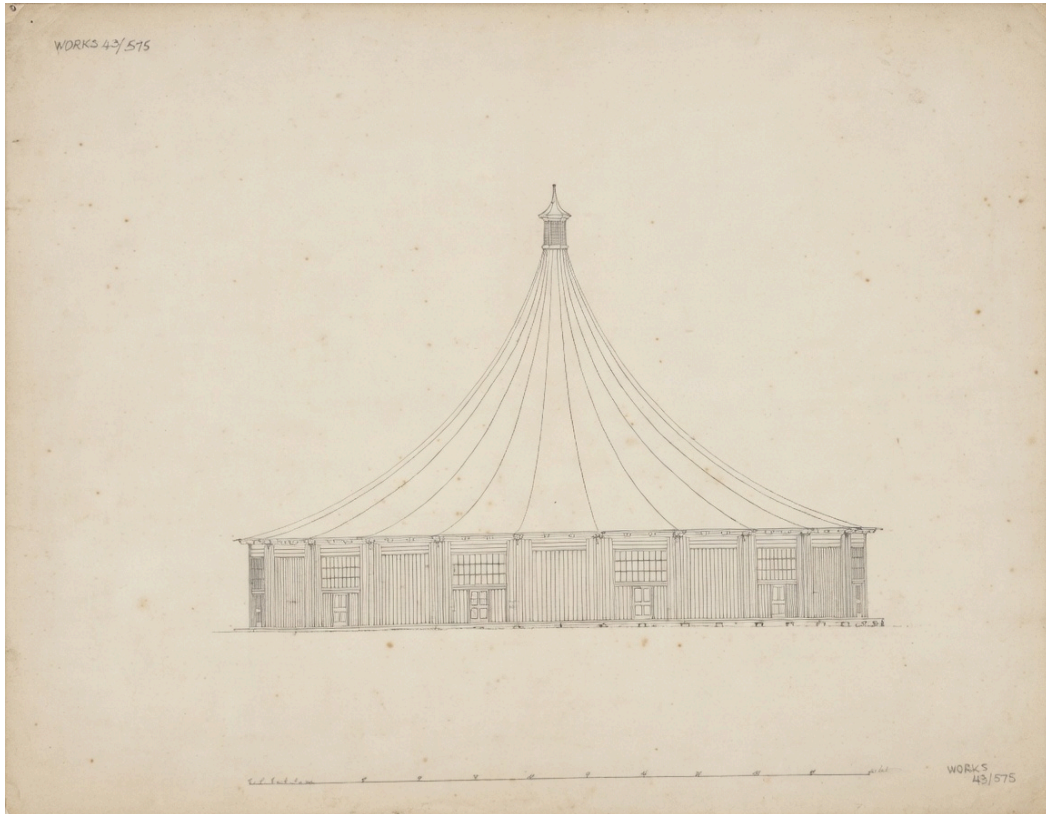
External elevation of Nash's 'tent room' at Carlton House, May 1814. The structure's walls appear to have been covered with decorative boarding and inset with twelve entrances. (The National Archives, ref. WORK 43/575)
